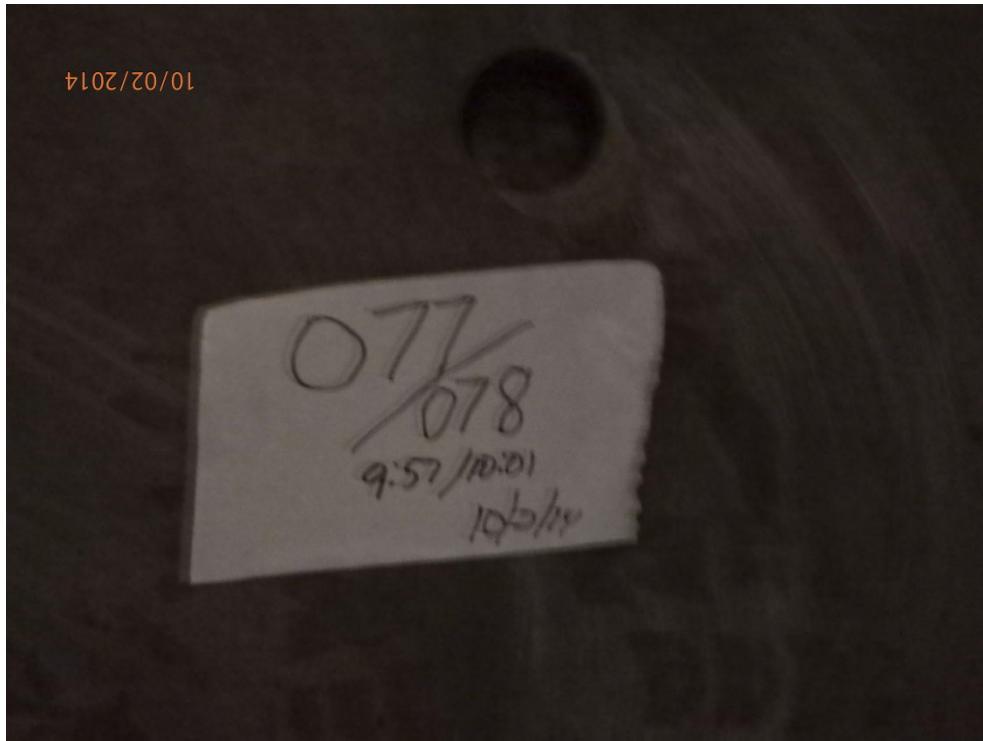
Samples 077 and 078 concrete core adjacent to Column F1
